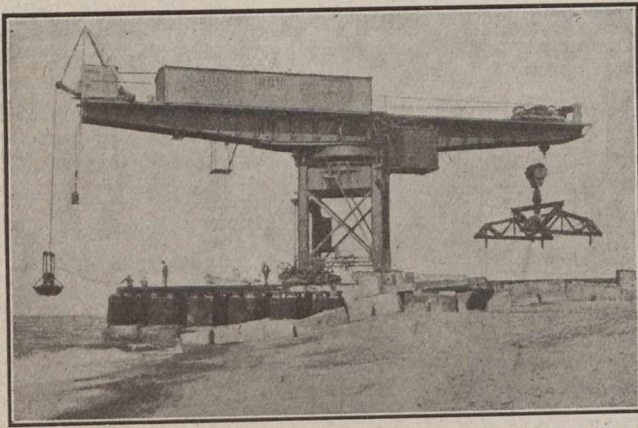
110-ton Crane Used in Placing Sections and Blocks.
